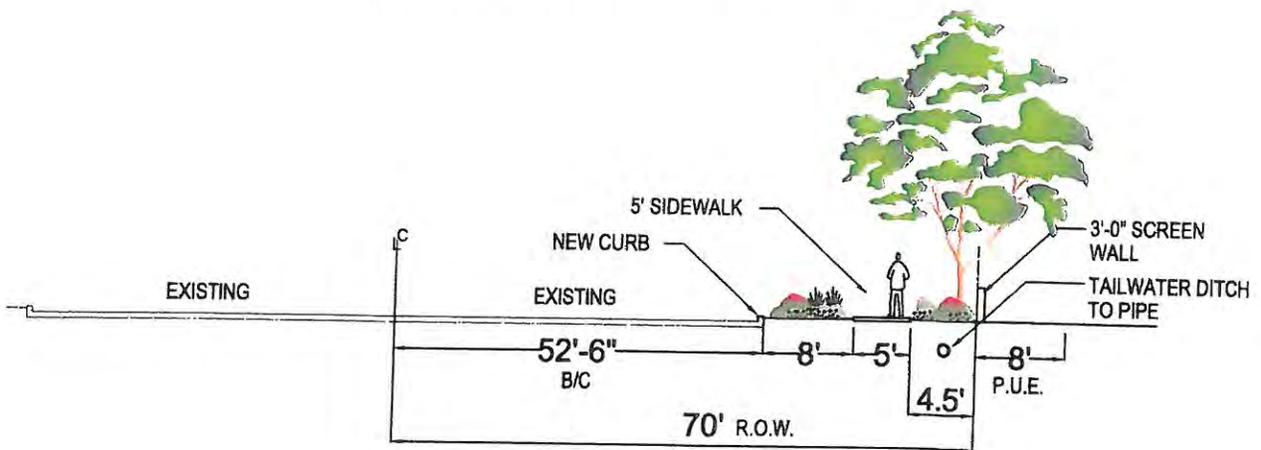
THEMATIC STREET CROSS SECTIONS
